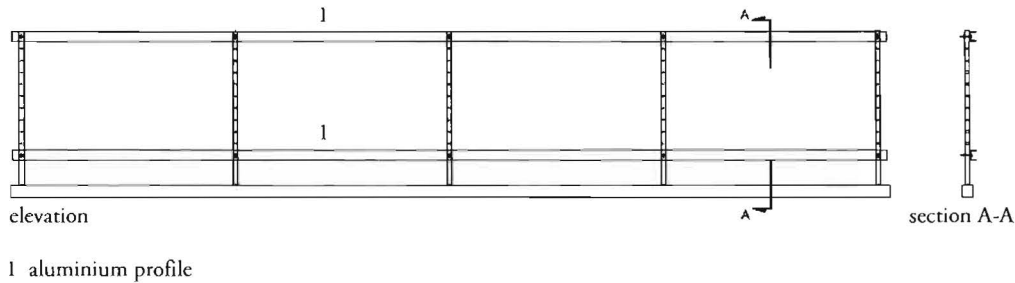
Specimen assembly setup; aluminium profiles provide bracing during and after welding of the strips to the steel column.
